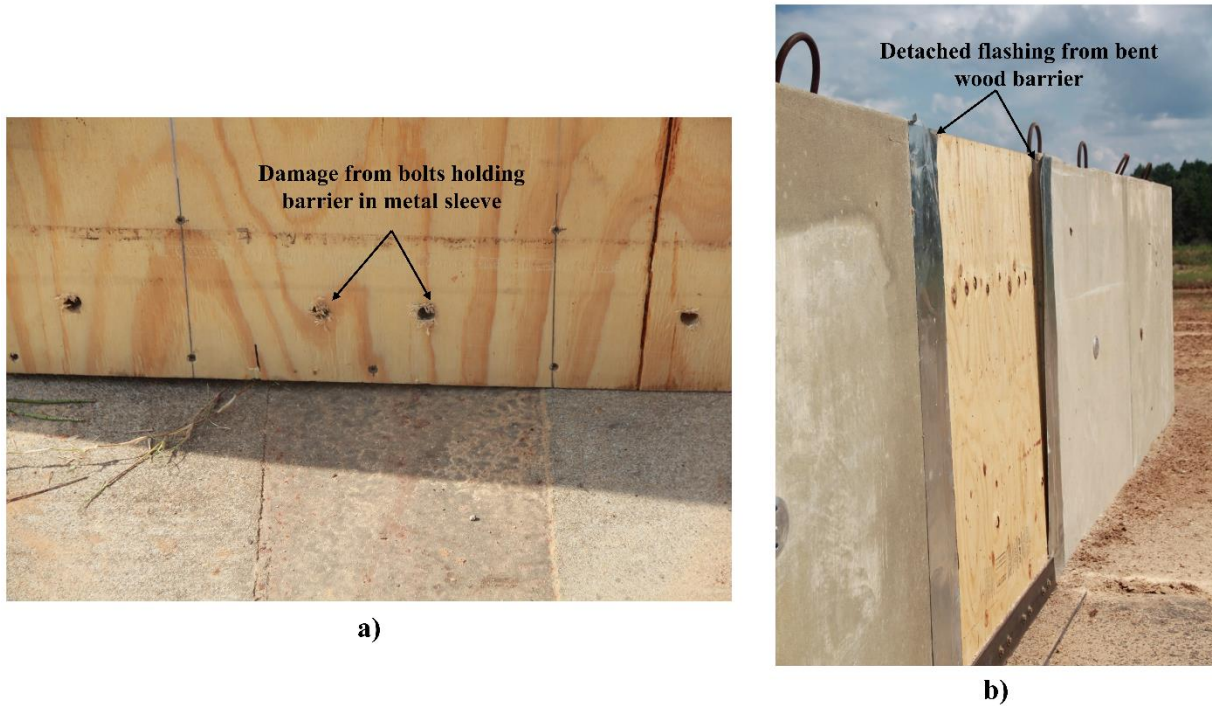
a) Bolt hole damage from experiment 5 and b) detached flashing from front side of barrier after experiment 5.
